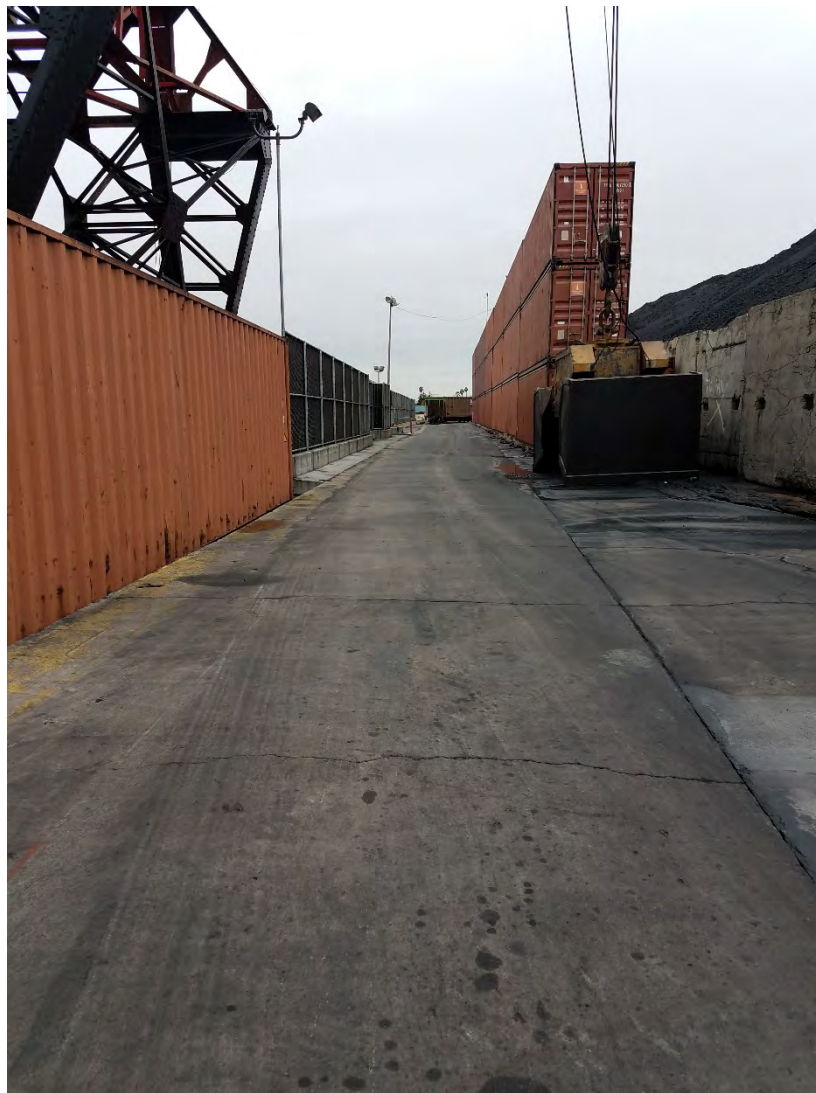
Looking north along western alley of secondary storage area: new curbing and wind fence added to 2015-2016 concrete work to widen road.
